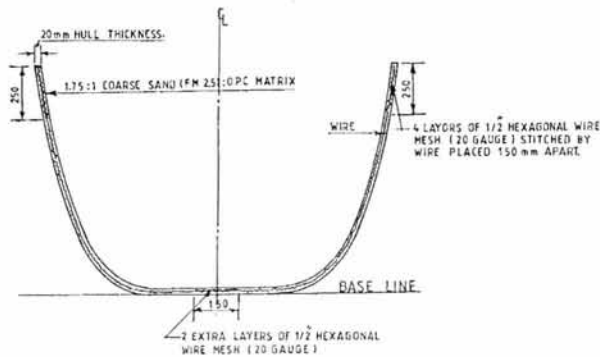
Section of the fibre reinforced concrete boat (22x4.75x2.75 ft)
